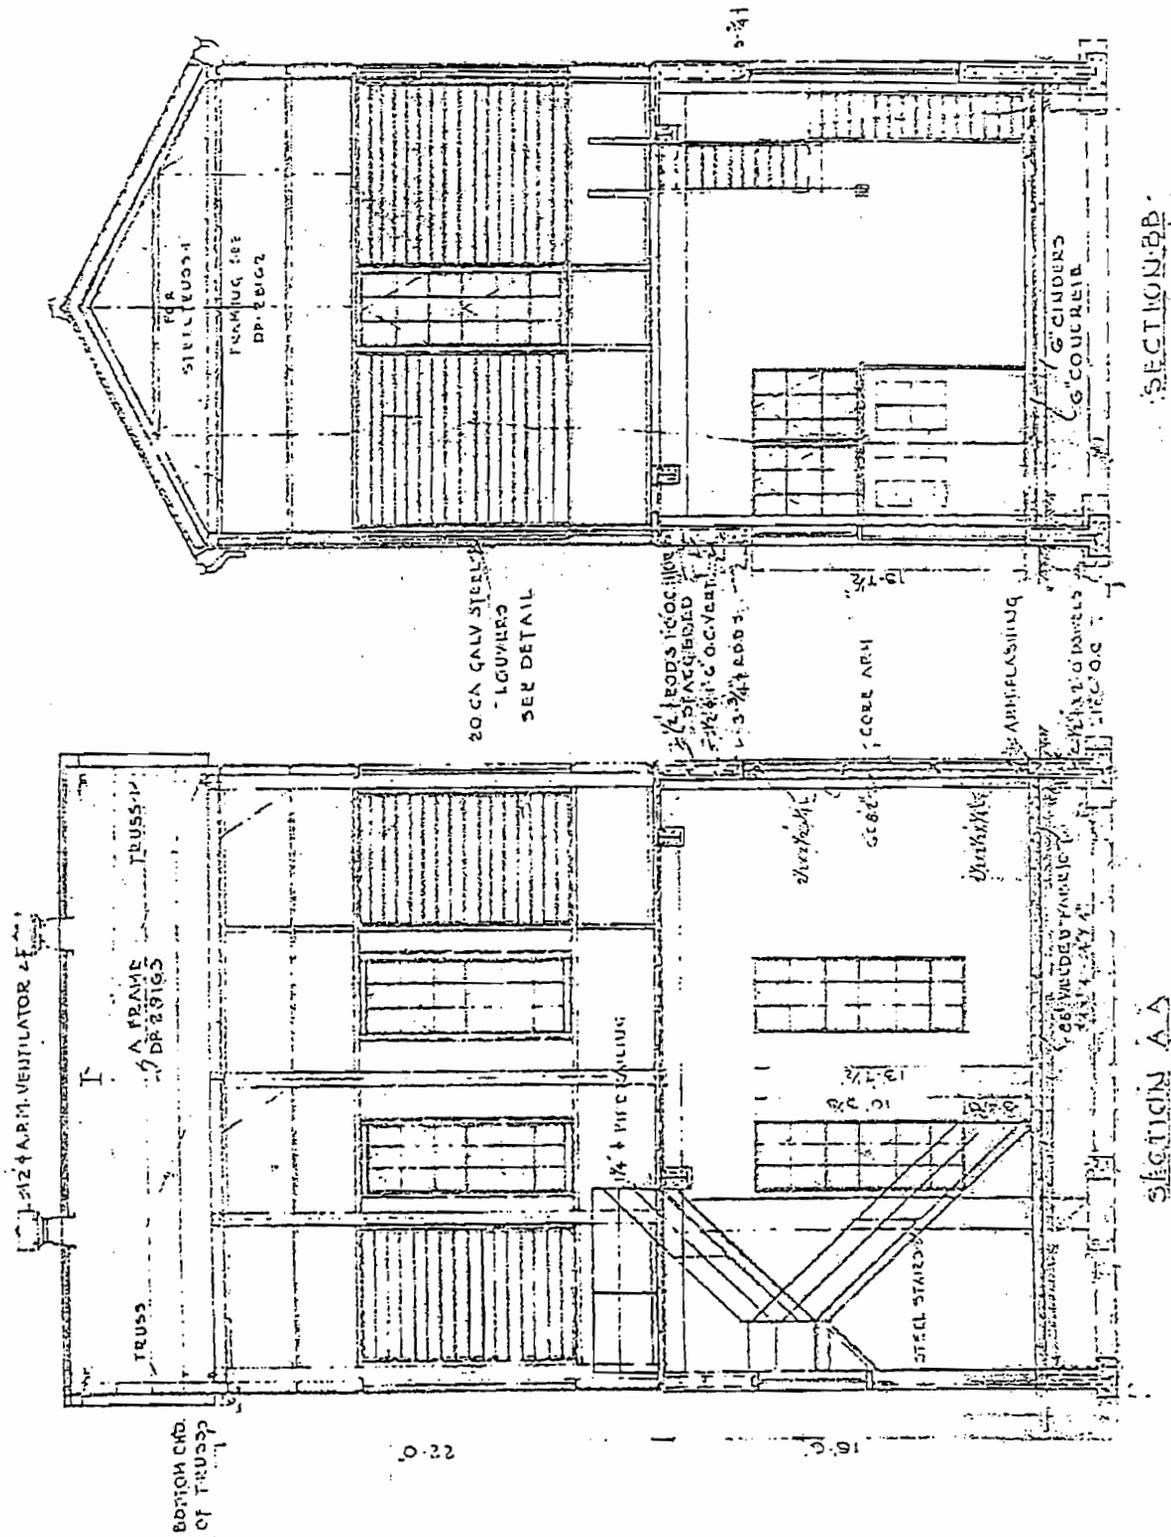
Building 607, Blueprint # DP-28161, detail from Building No. 607, Shell Fragmentation Bldg., Plans, Elevations and Sections, May 2, 1940, War Plans Division, Ordnance Department, Picatinny Arsenal, Morris County, New Jersey (on file in DPW, Picatinny Arsenal.)
